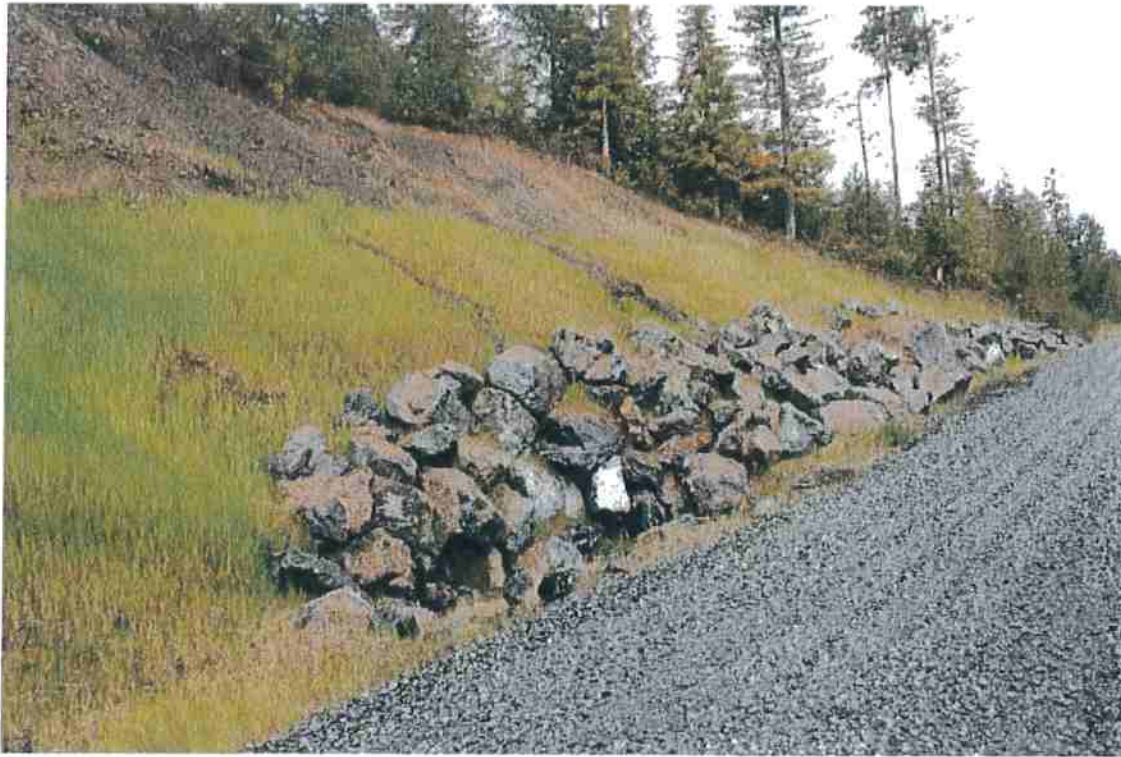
This wet and potentially unstable cut slope on a newly constructed road was stabilized using a buttress of large rock armor. To assure their effectiveness, rock buttresses and other retaining structures should be designed by a qualified engineer or engineering geologist.
